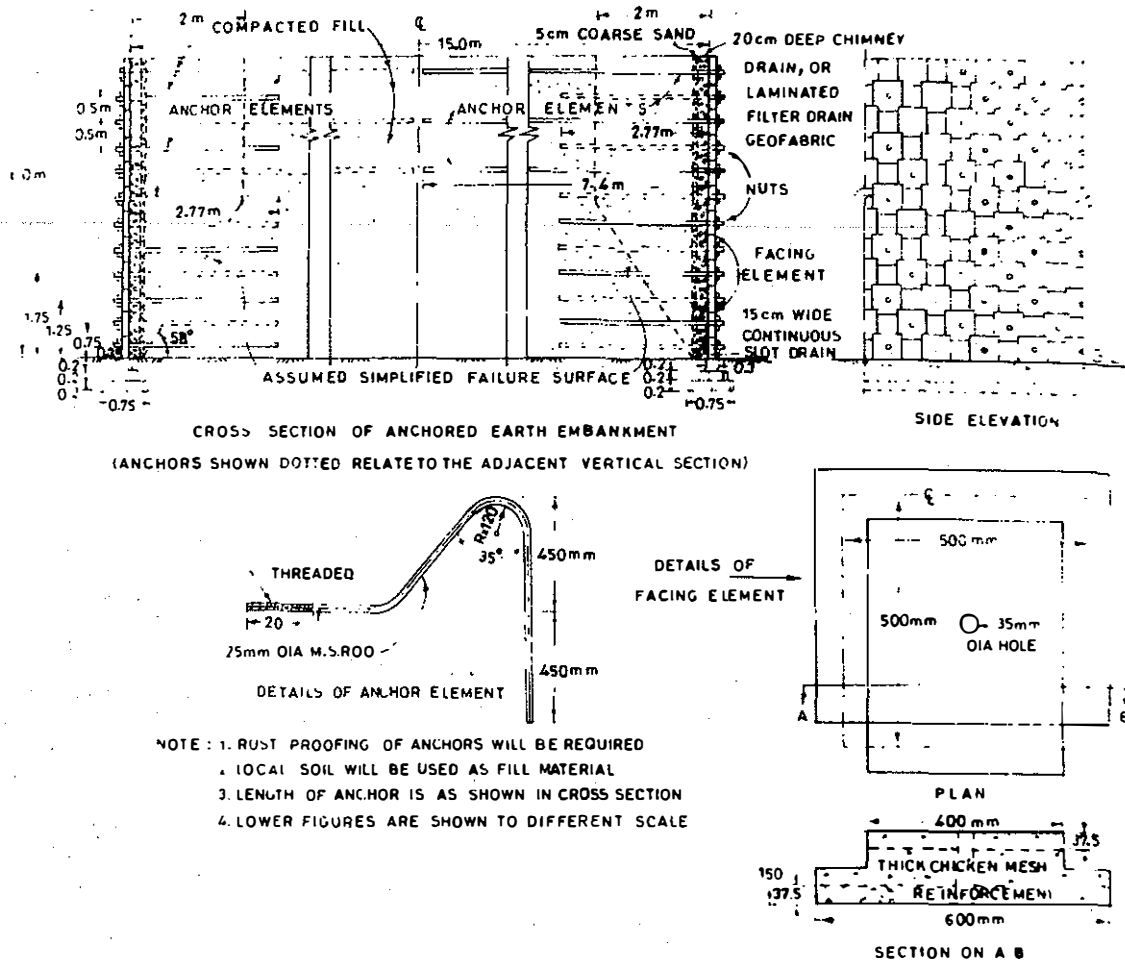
Design II for approach embankment for new Varuna Bridge at Varanasi
